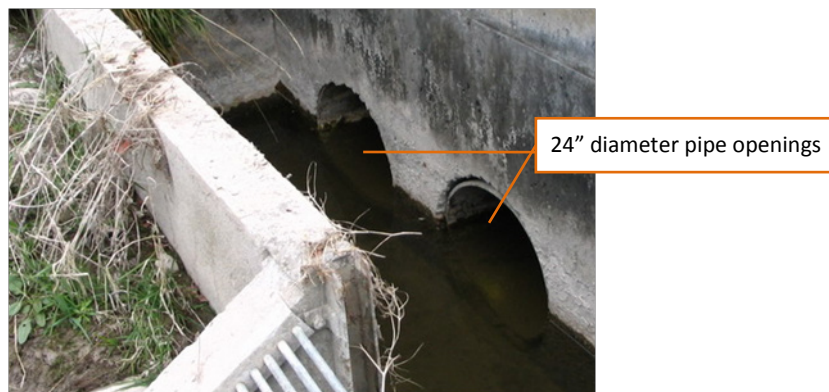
New propeller meters to be installed in Lower J Canal spill culvert pipes. Photo from HKM 2008 report.
